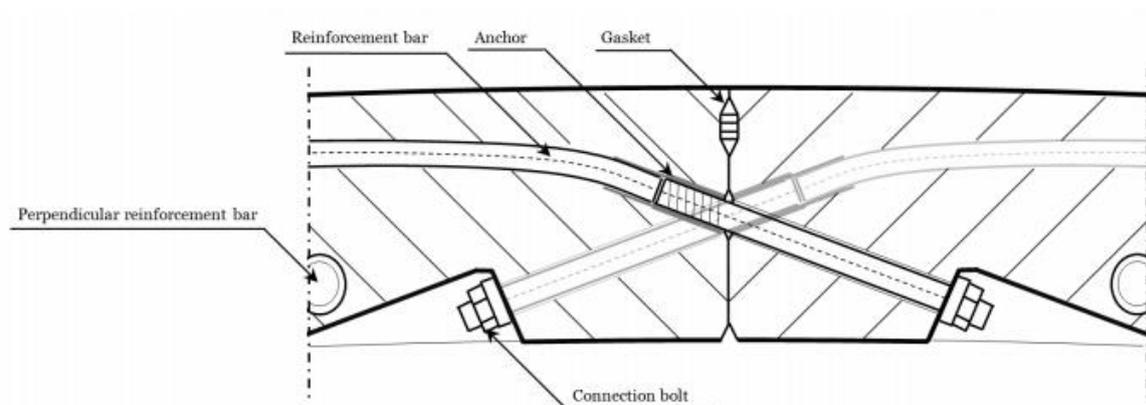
8: Detailed connection between thin-shell prefab elements using bolted connection
